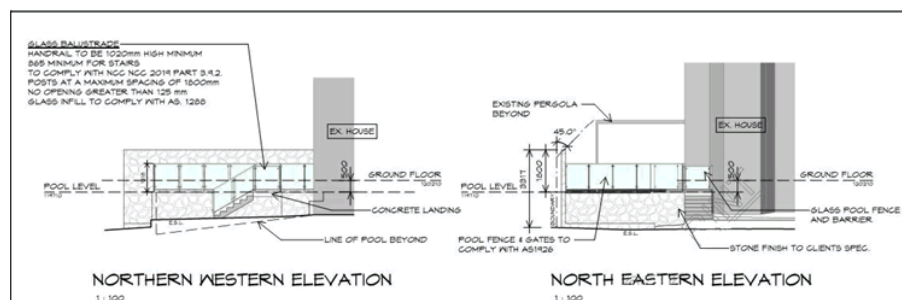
North East and North West Elevations (internal views within site) (Prime Design, 2022)
